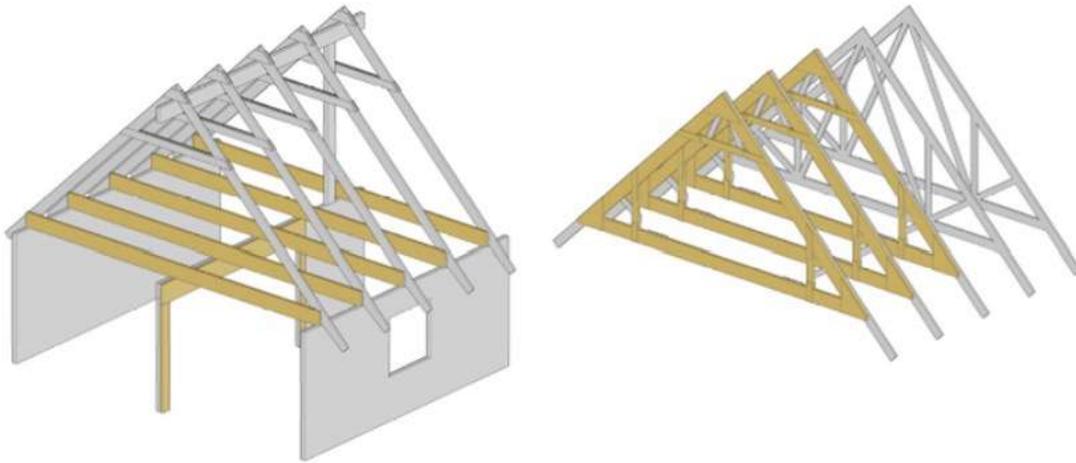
Renovation applications, left: LVL floor beam reinforcement, right: attic frames for room in roof space with LVL reinforced roof trusses.
